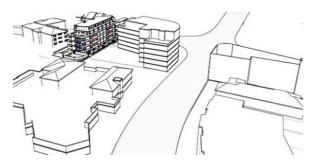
Fig F – View from east looking west along Liverpool Road. Eastern façade of the building stepped to allow solar access to the south in the morning. The two upper levels above the height are setback significantly from the southern boundary to reduce potential impacts and provide visual separation (14.435m provided between upper level and existing RFB to the south).
